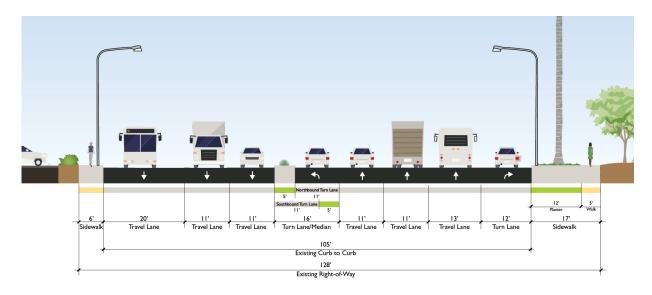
Existing Conditions Cross-section: Dakota Avenue to Dayton Avenue (facing North)
